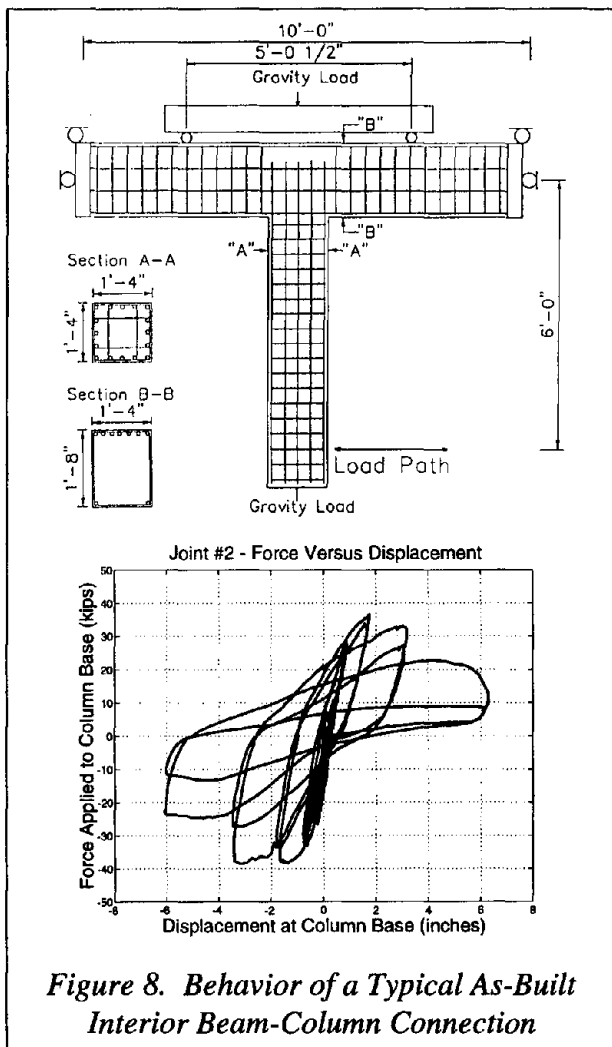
Behavior of a Typical As-Built Interior Beam-Column Connection
